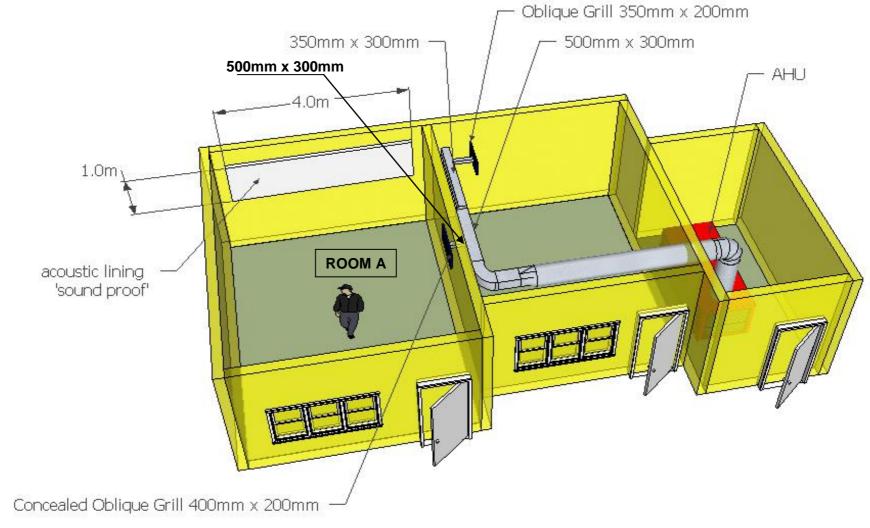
(b): Perspective view (detail dimensions for all ductings)
